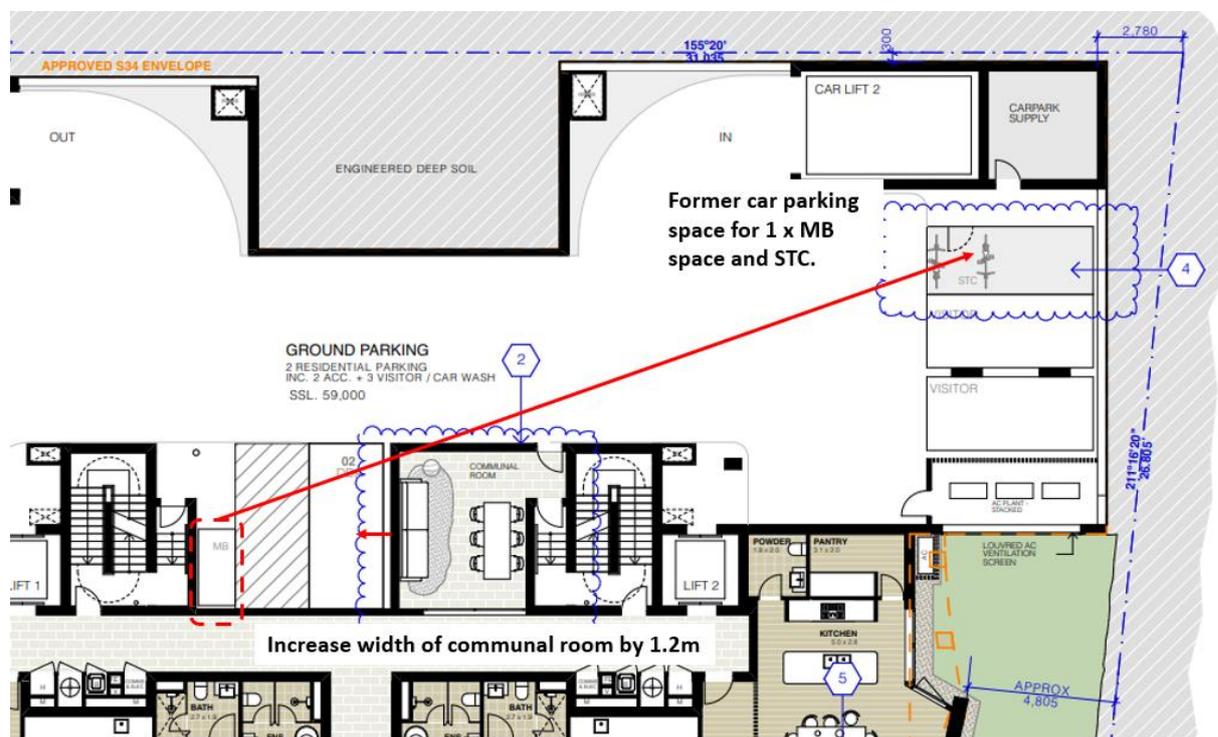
Proposed modified Ground Floor Plan (DA 2002 Rev F) detailing amendments subject to Condition of Consent.
